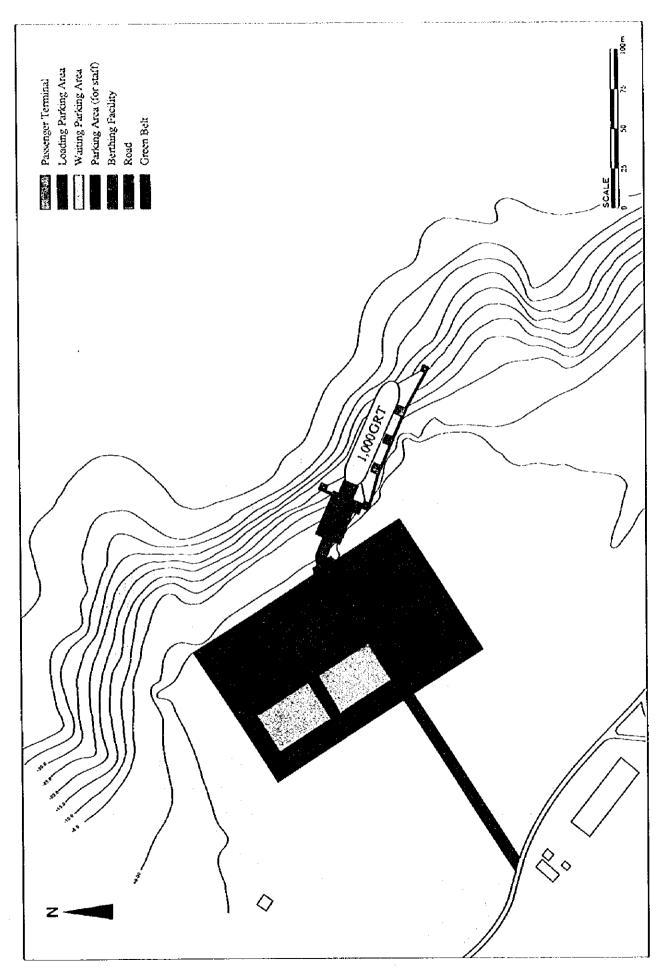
Layout Plan of Babang Ferry Terminal
